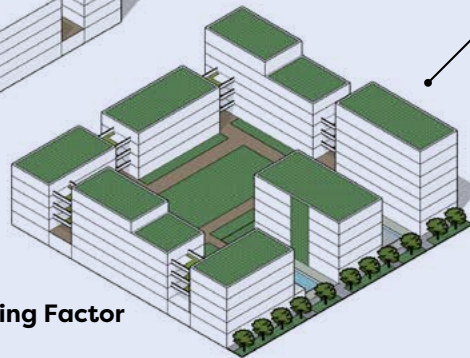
APPLYING THE URBAN GREENING FACTOR TO MAKE AN APARTMENT SCHEME MORE PERMEABLE FOR WATER
